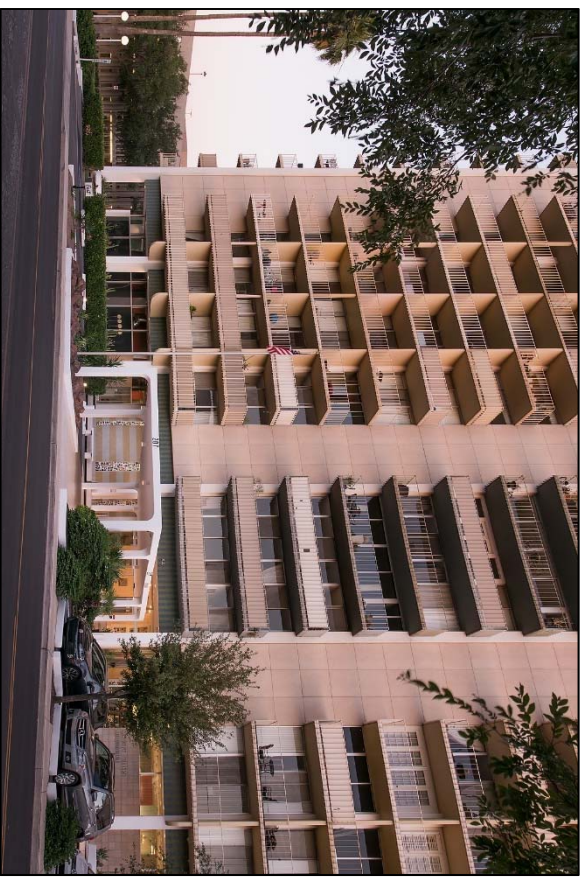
Base of north elevation, main façade, showing porte-cochere and entrance, looking southeast.
